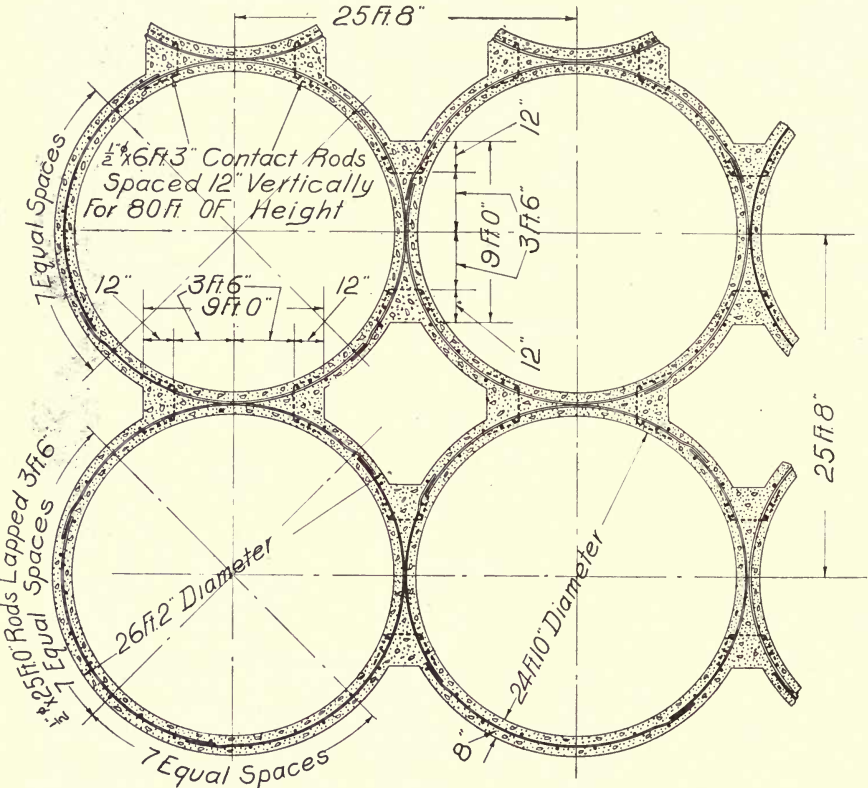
SECTION THROUGH BINS, TYPICAL CONCRETE GRAIN ELEVATOR.
